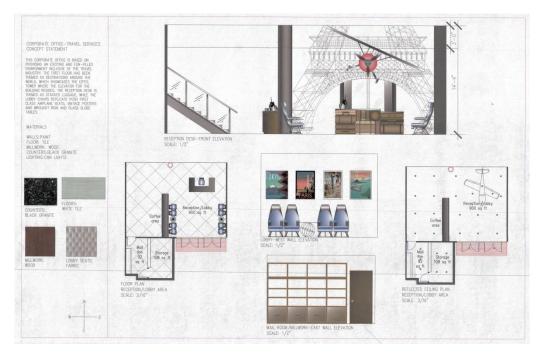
Example of Two Dimensional Drawing, Drawing Scan, March 2016. (Student Work – Unidentified)
